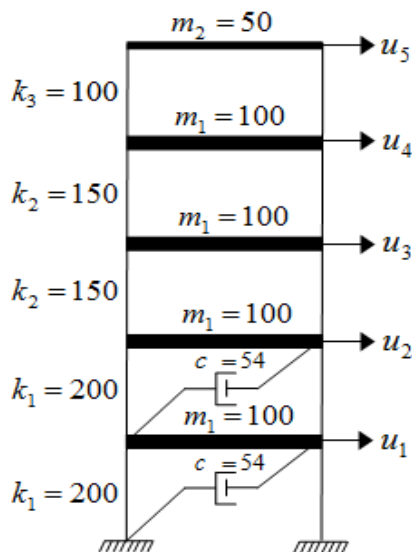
Five-storey structure with two dampers at the first and second floors.
